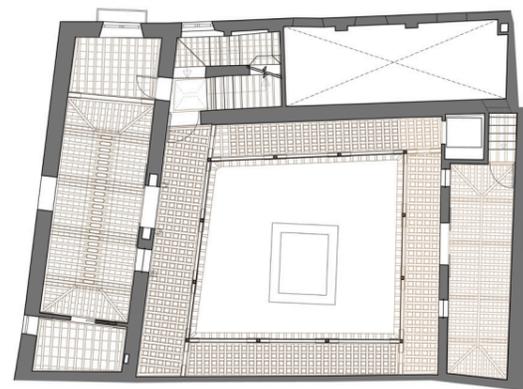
Upper floor plan, with ceiling projection, after restoration. © Orihuela, 2024
